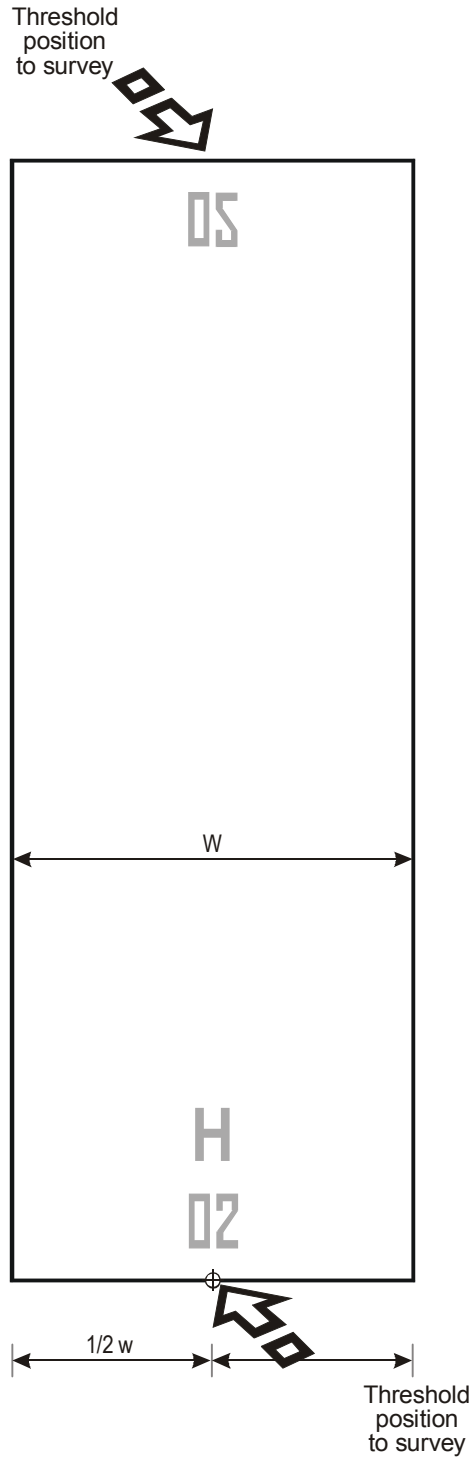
B-4. TLOF and FATO planimetric threshold positions to be surveyed
